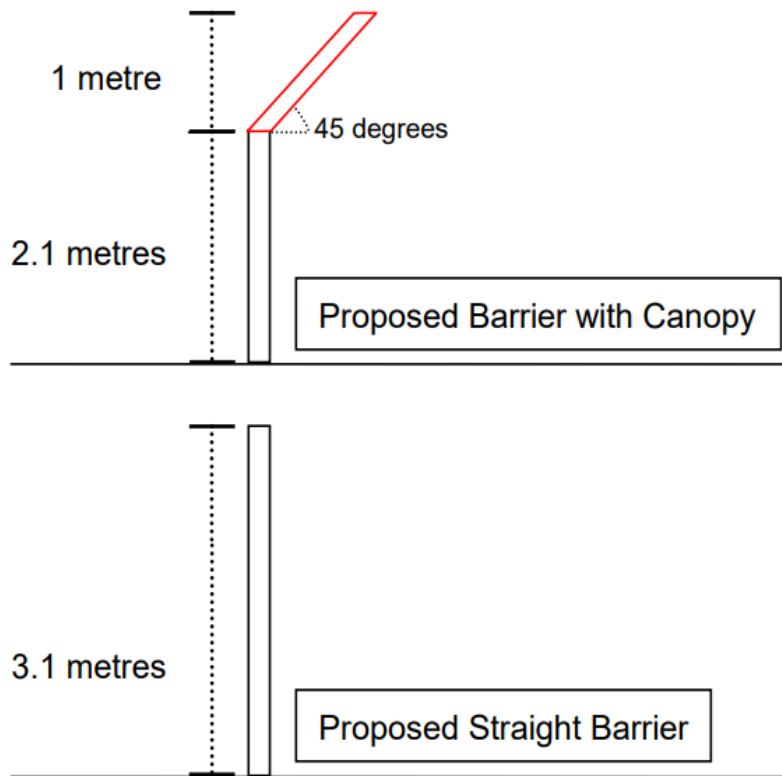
Acoustic barrier detail (Source: Applicant's Acoustic Assessment Report)
